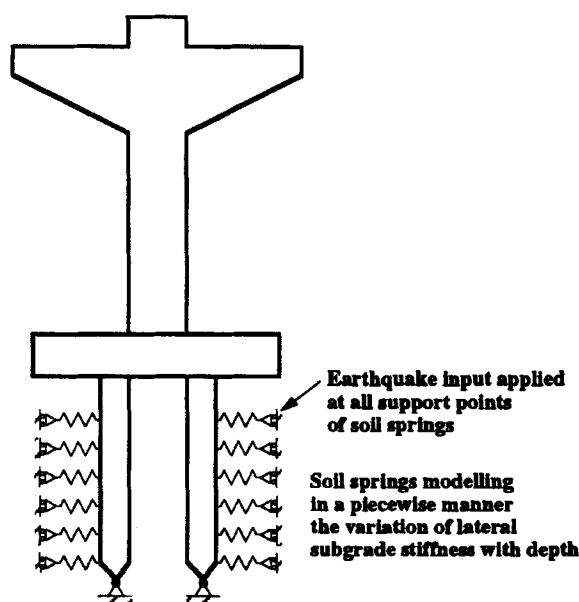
Modelling assumption MS (4) (pier incorporating foundation structure and soil stiffness)
